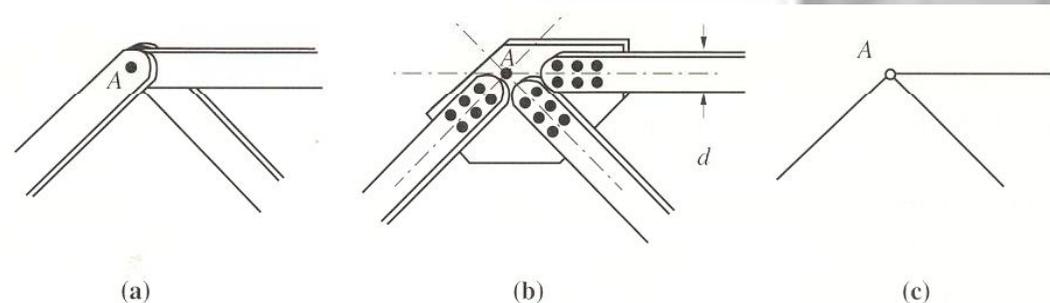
(a) Plane frame members held together by a single pin. (b) A riveted or bolted connection. (c) The idealized pin joint.
